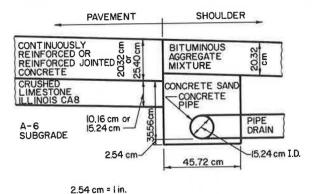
Subdrainage systems at test sections on I-57 in Illinois.
